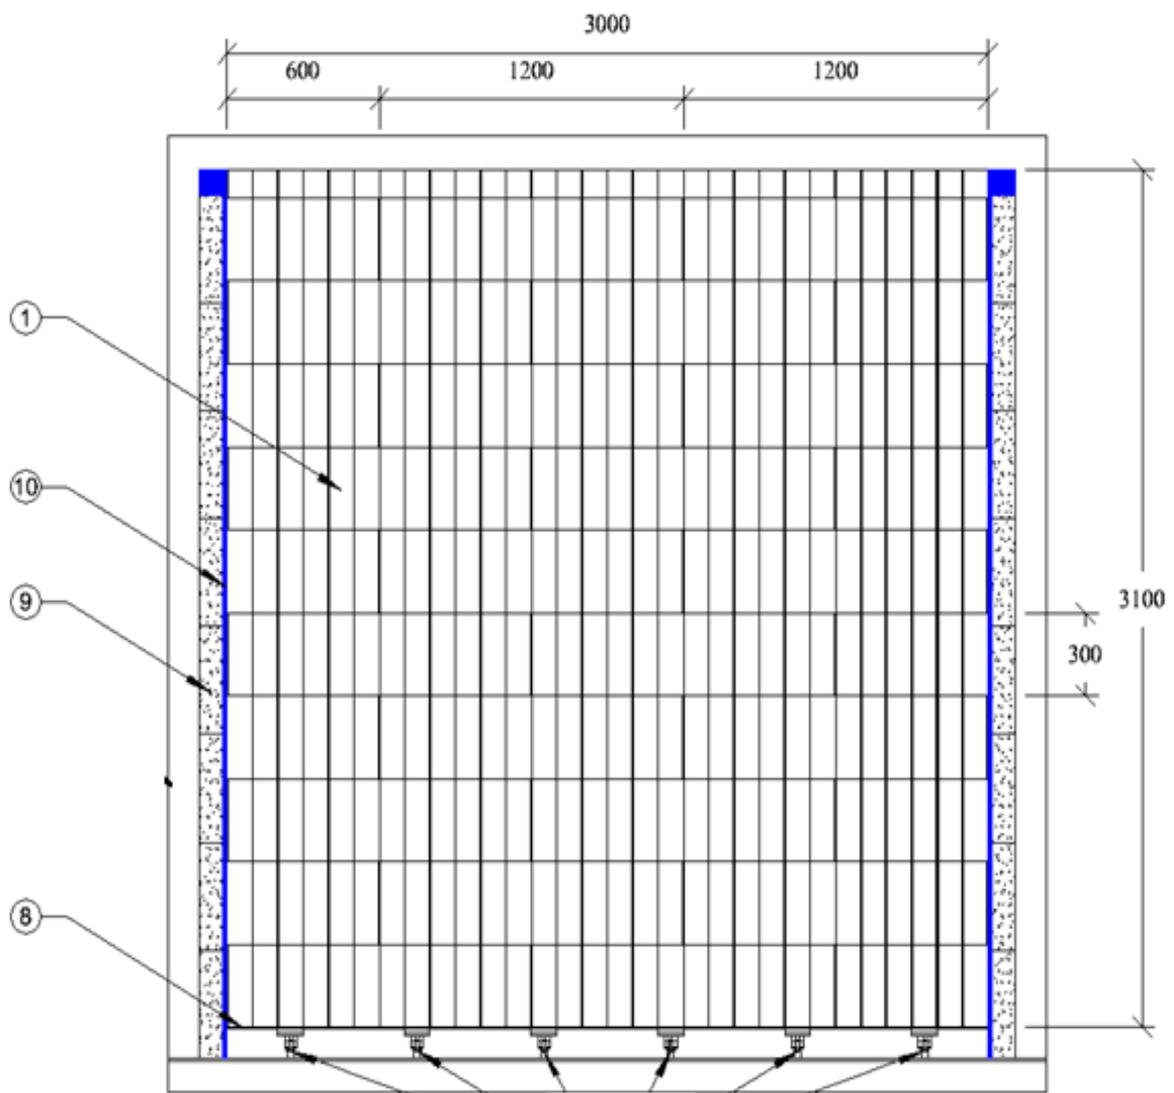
Face elevation of Polyfoam Polywall® ICF blocks (extracted from EWFA 2489001.1)
